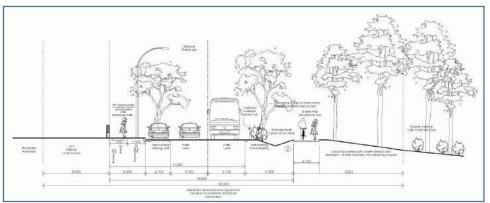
Road Section - Indicative Bushland or Riparian Edge Street.
